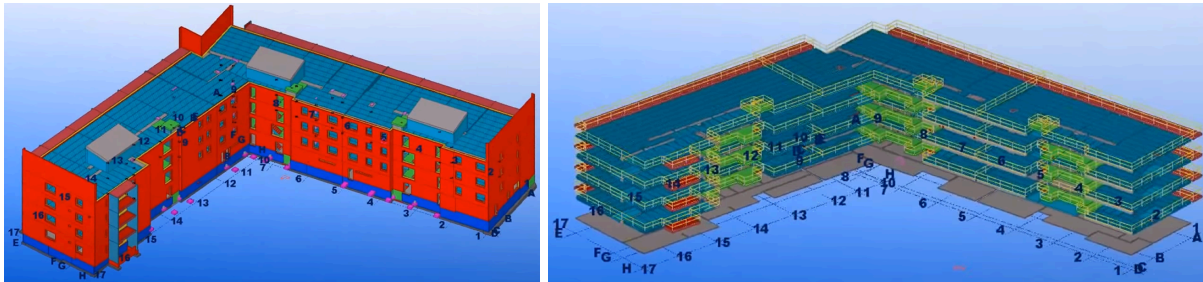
Structure designed in Tekla and check for slab edge, covers, guardrails
